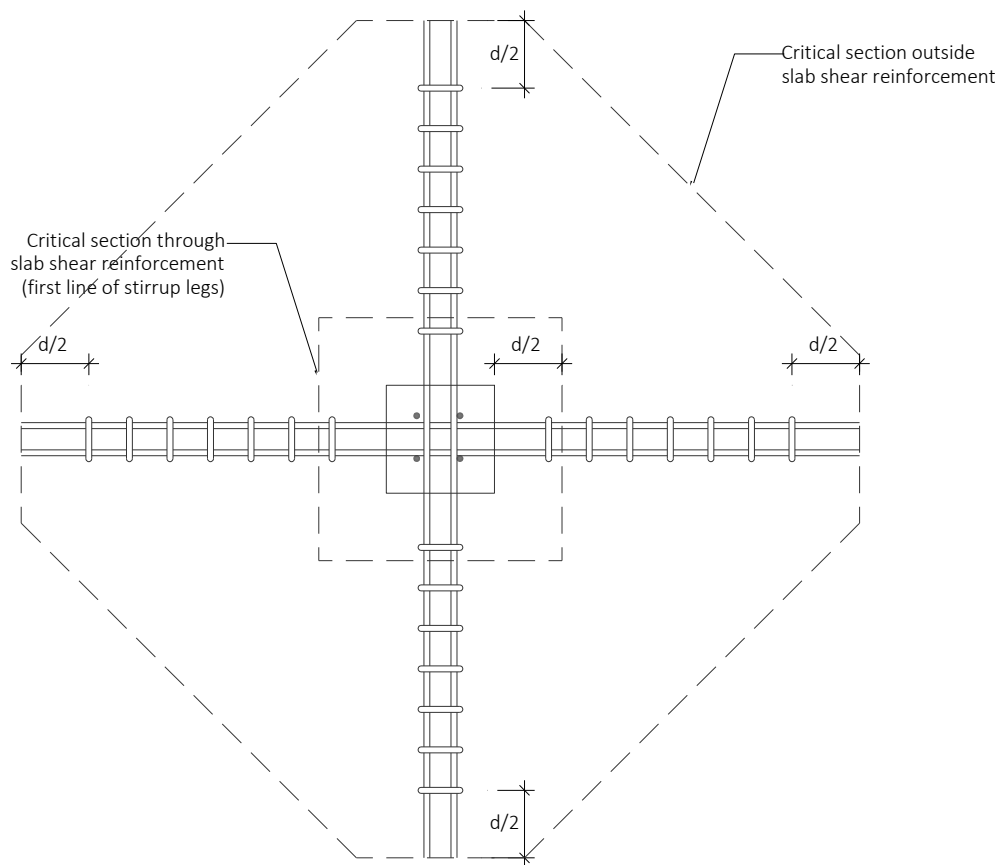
Arrangement of stirrup shear reinforcement, interior column (Adapted from ACI 318-14)
